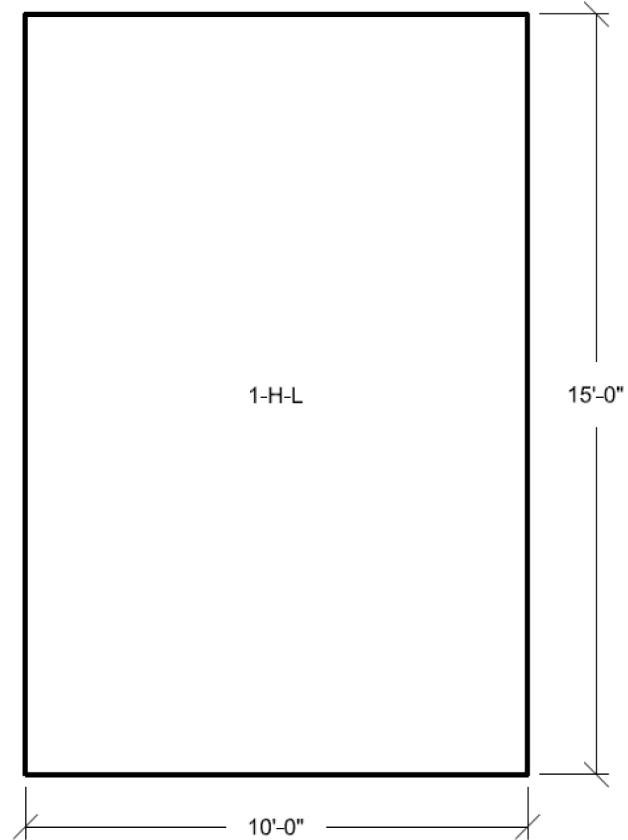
H.6-203B DGFOSV Wall 15 Looking From Outside
